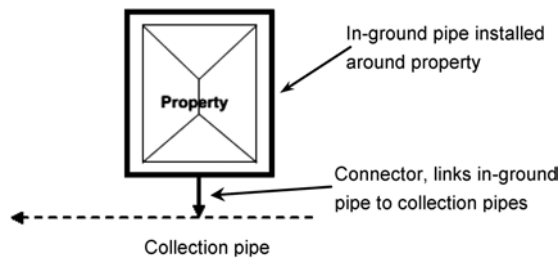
Schematic of a typical connection to the CRWH collection system.
